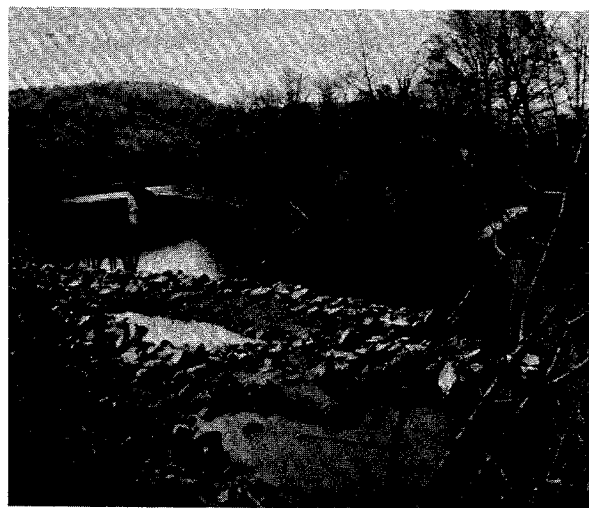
View upstream in 1976 toward spurs on right bank. Note accumulation of sediment.
